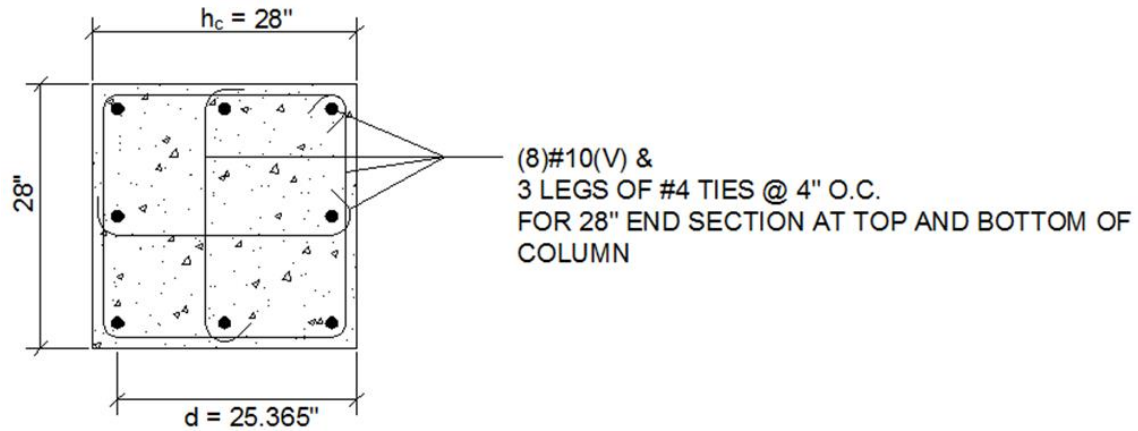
Existing exterior MRF column cross-section at end of column at ground floor level based on SDC D design.
